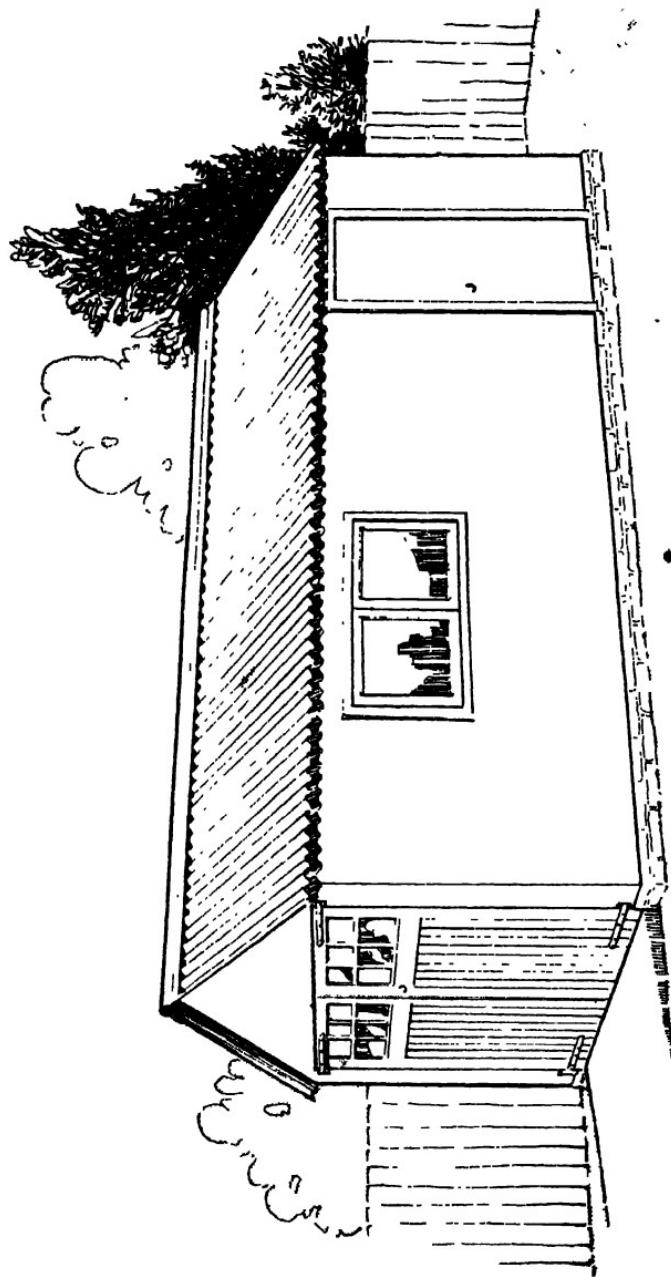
TIMBER-FRAMED GARAGE WITH ASBESTOS-CEMENT WALLS AND ROOF.
